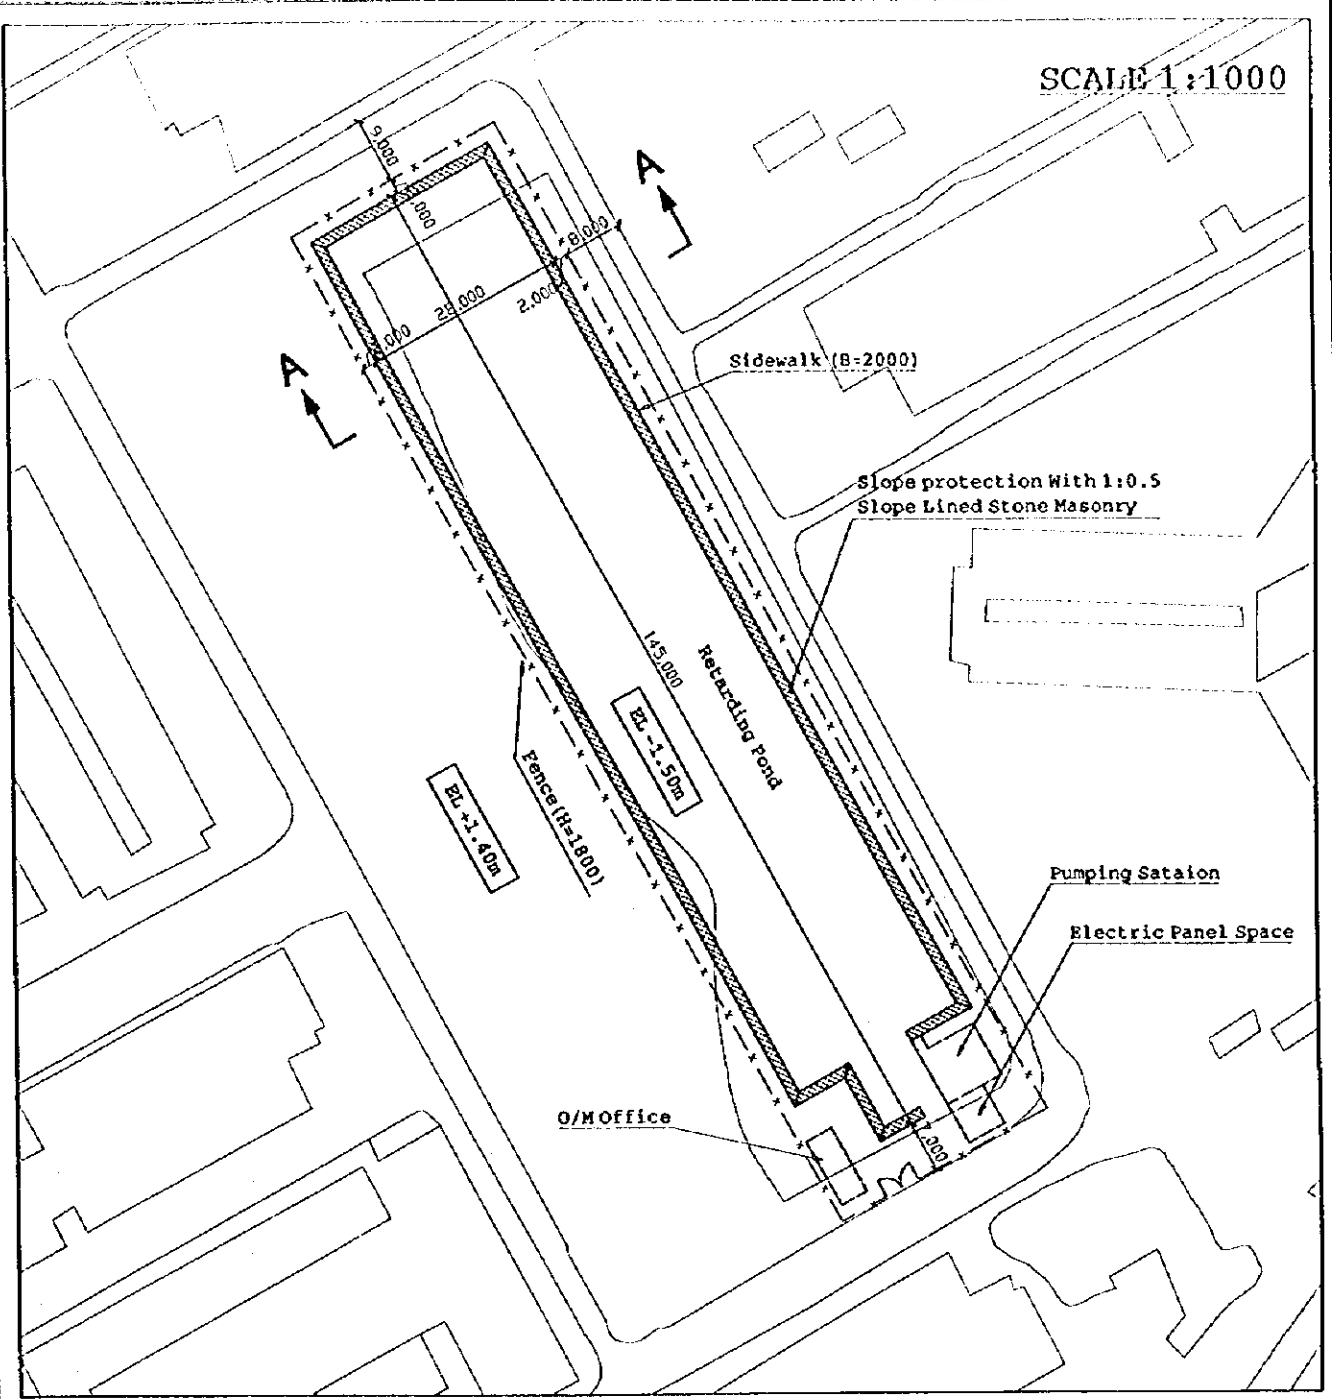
(1/4) LAYOUT OF PROPOSED RETAINING POND OF THANH DA PUMPING STATION
